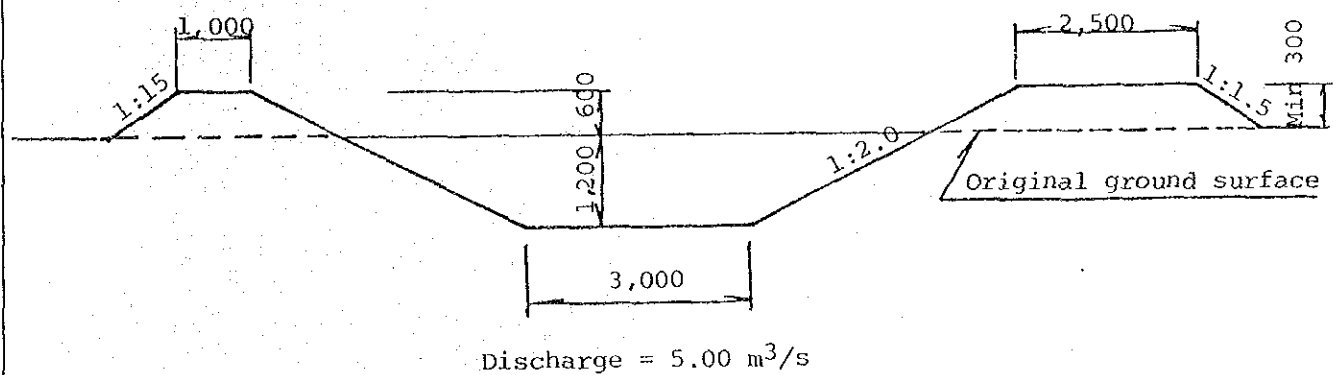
Typical Cross Section of Irrigation and Drainage Canals for Model Area
